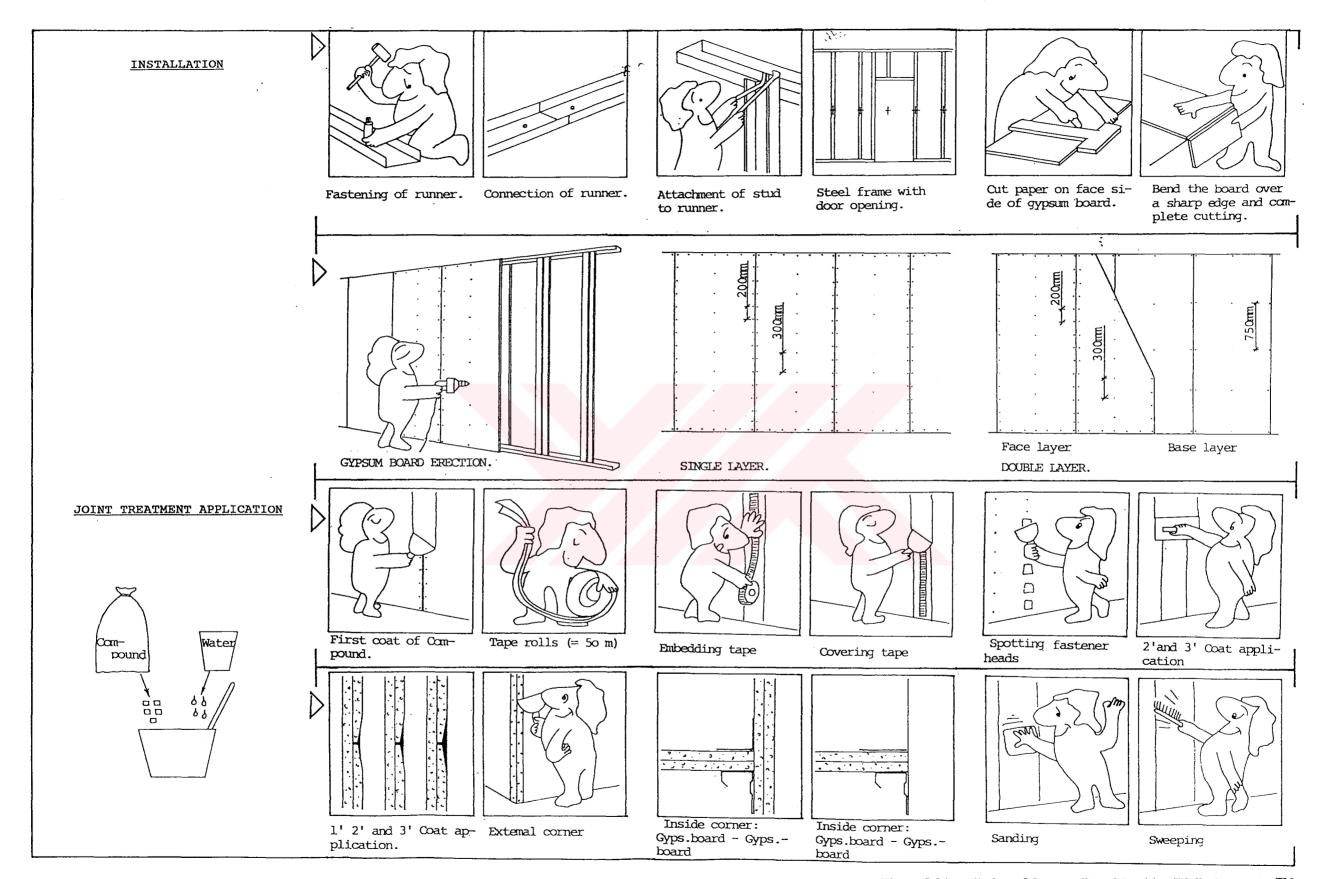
Installation of Gypsum Board Partition Walls (DanogipsTM)
